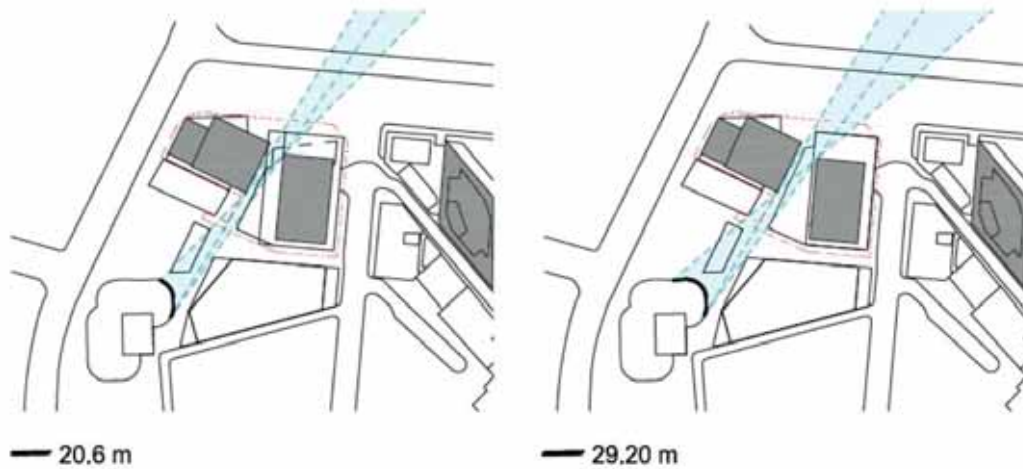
Extent of views still received from 200 George Street despite the lodged proposal (left) and revised proposal (right) (Source: Applicant's RtS)
